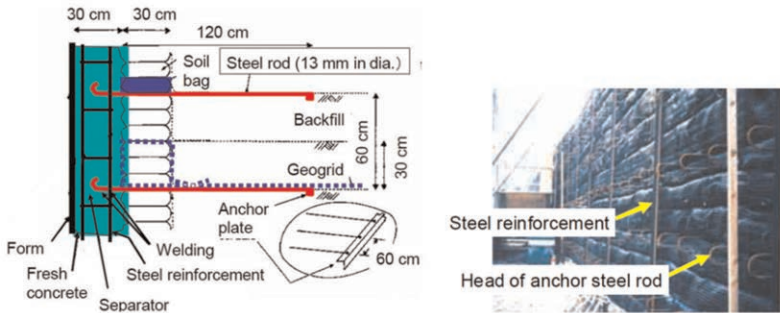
Typical connection detail of FHR-GRS concrete facing and the geosynthetic reinforced fill (Tatsuoka 2008).
